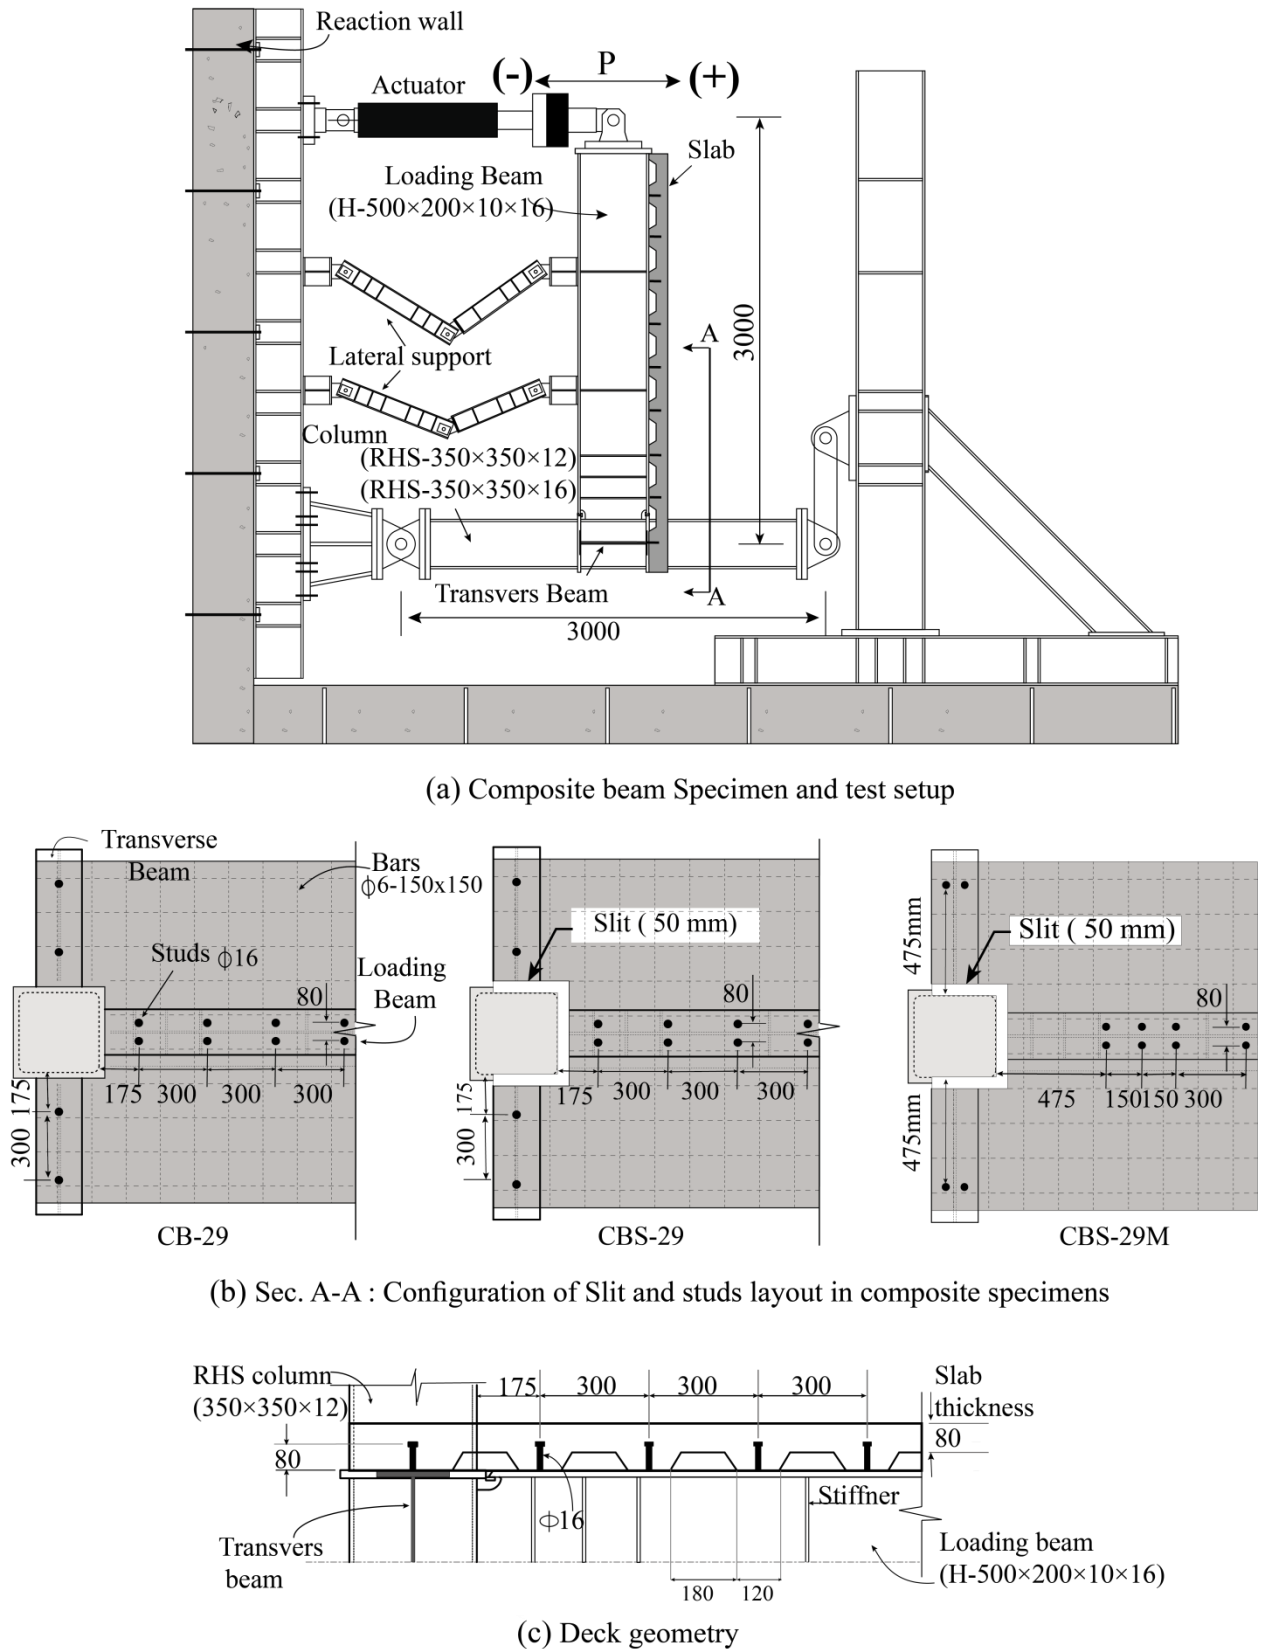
Configuration of specimens and test setups of composite specimens
